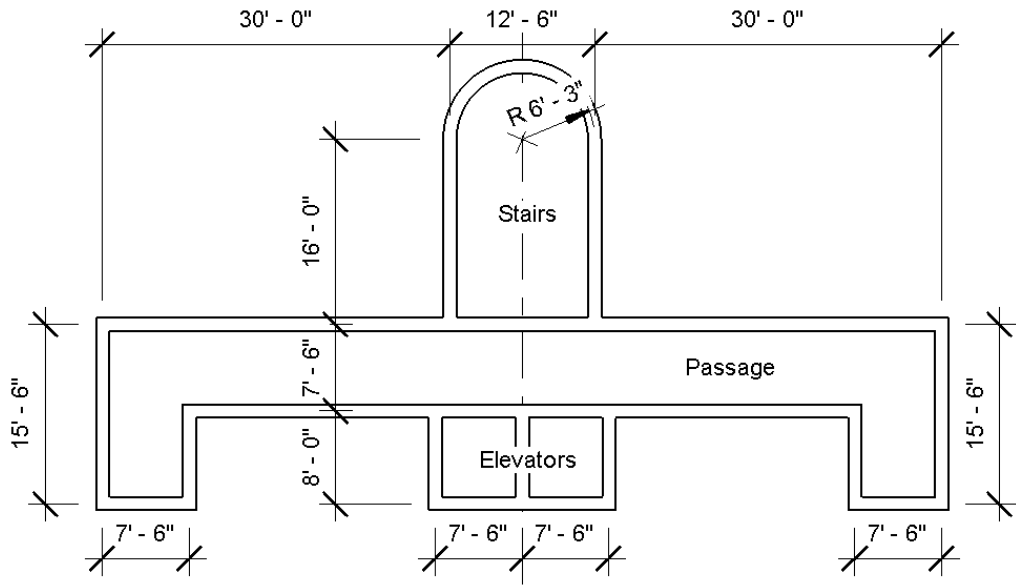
Sketch plan for creating the exterior walls for the Elevator and Stair Lobby project
